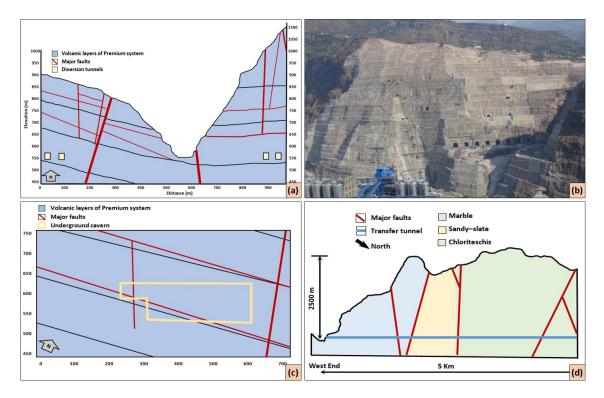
The layout of the hydropower project; (a) cross-section of geological formations, (b) a layout of tunnels, (c) a cross-section of an underground cavern in 500m depth, (d) longitudinal cross-section of geological structures of transfer tunnel in 2500m depth
